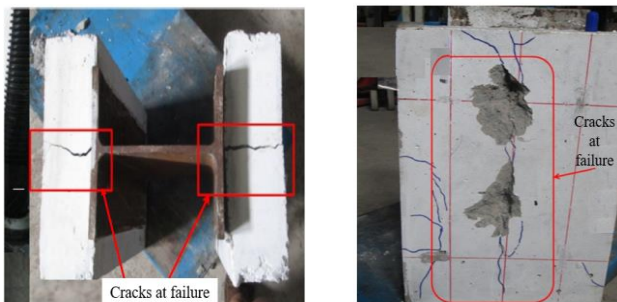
Cracks on the concrete slab at the end of testing.
